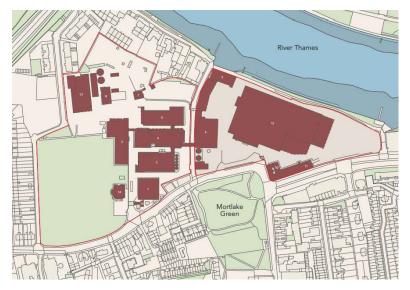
Indicative plan of existing Former Stag Brewery buildings
